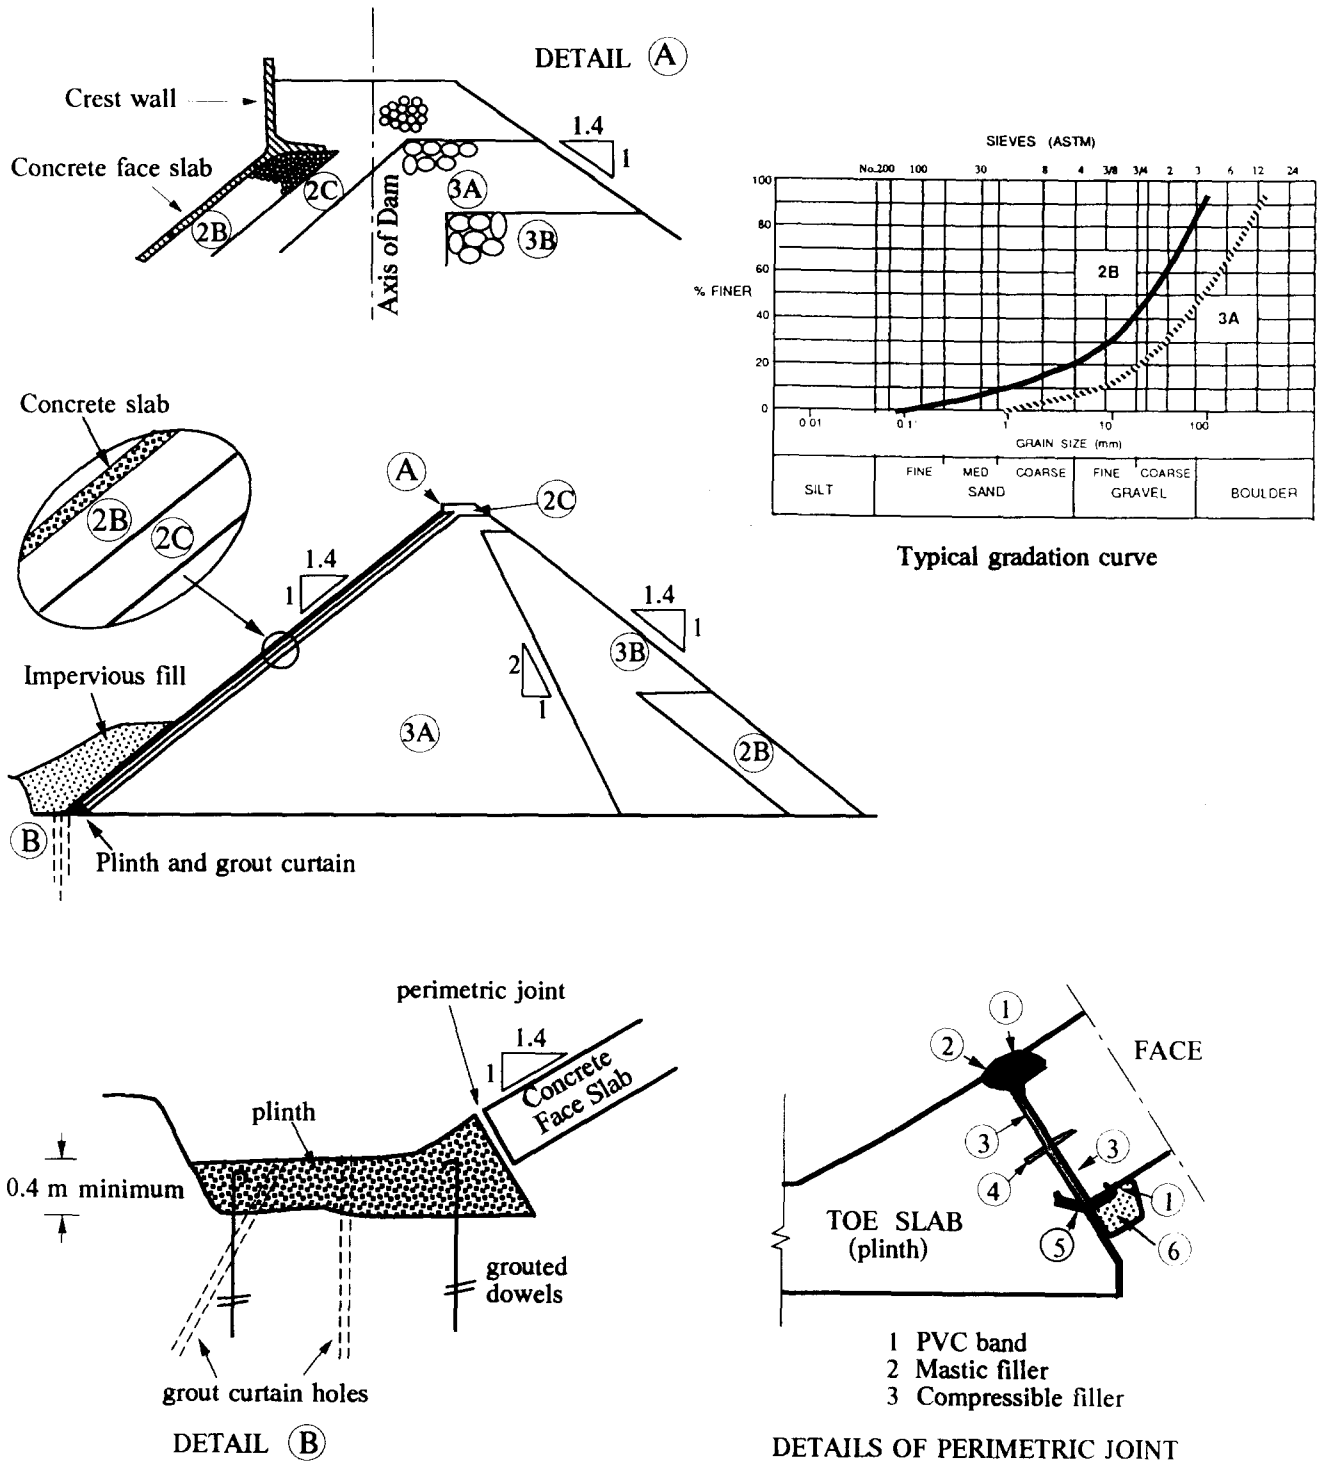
Typical cross-section, details, and material composition of a CFR dam.
